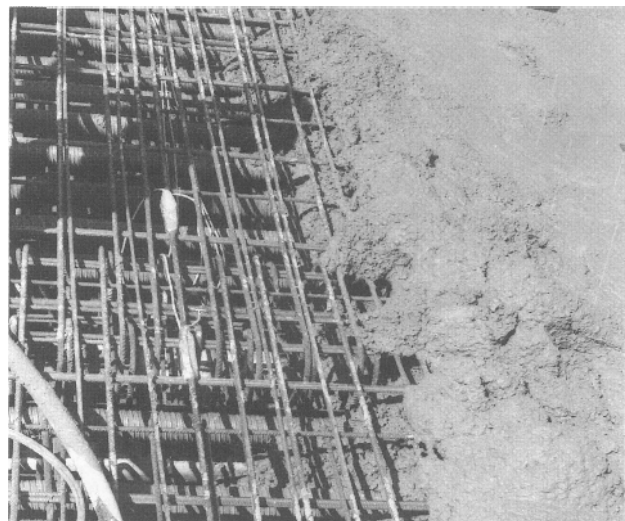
View of the strain-gage measuring points on the transverse reinforcement shortly before the concrete was poured.
